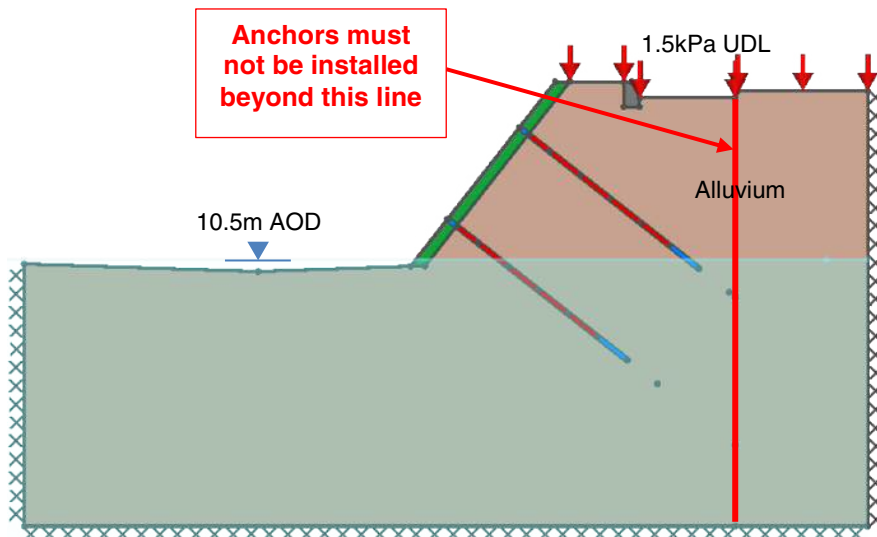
LimitState GEO model for cross section B-B – Reinforced slope
